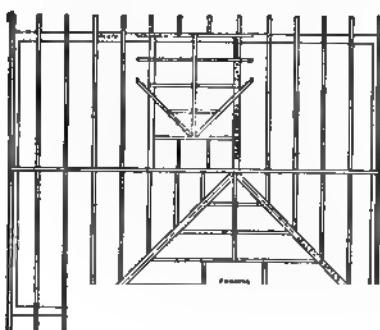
Roof Framing-Plan, with Gable, Hip and Dormer.
